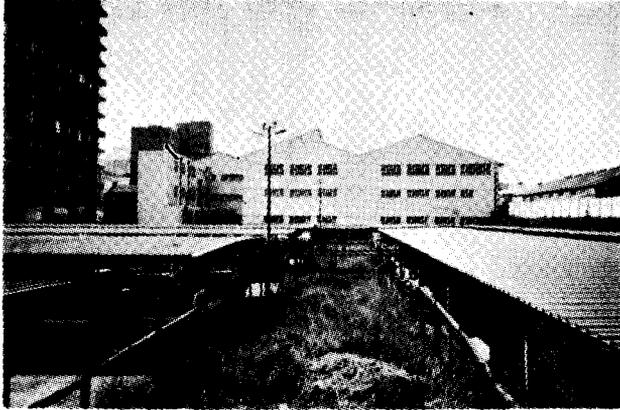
The fenced-off area next to the building (building B in Fig. 69) marks the strike of the South Reef
